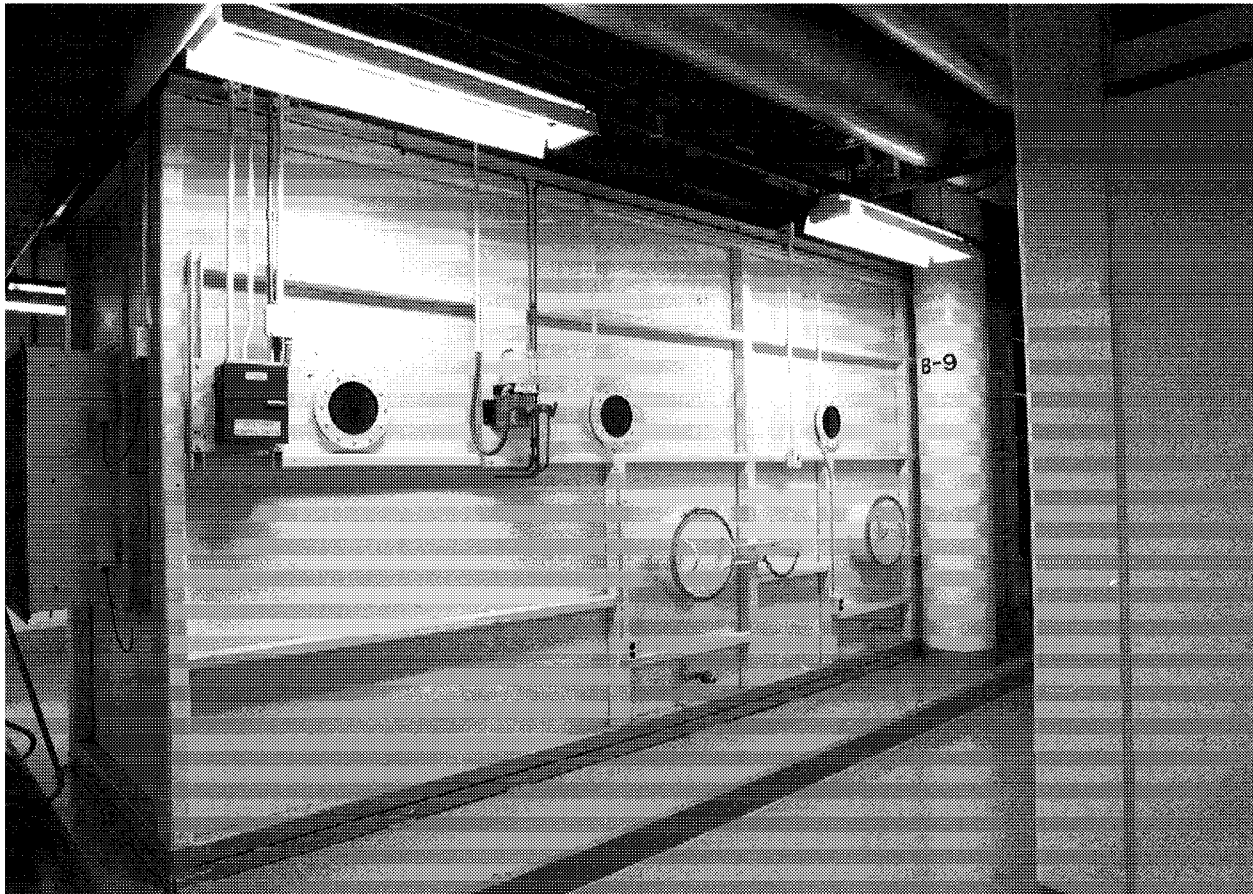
This filter plenum contains a series of HEPA filters and is constructed of structural steel tube frames with continuously welded steel plates for the walls, floor, and roof.
